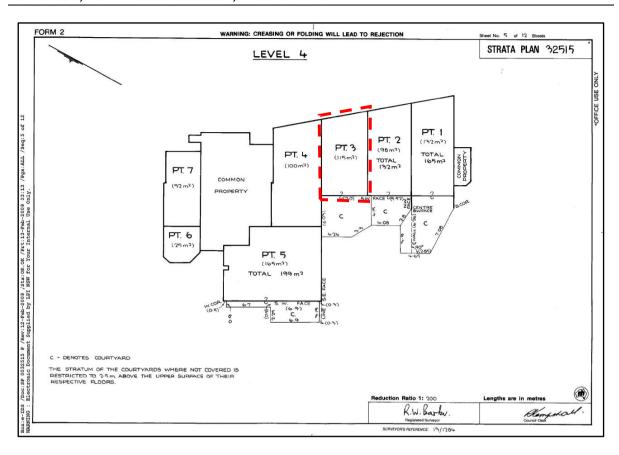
Strata Plan 32515 detailing the ground floor (Level 4) location of Suite 3 and adjoining ground level courtyard (see also Figure 14).
